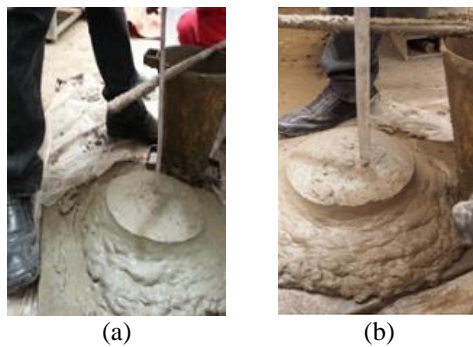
“Foam-Like” Slump (Bacterial Concrete).
